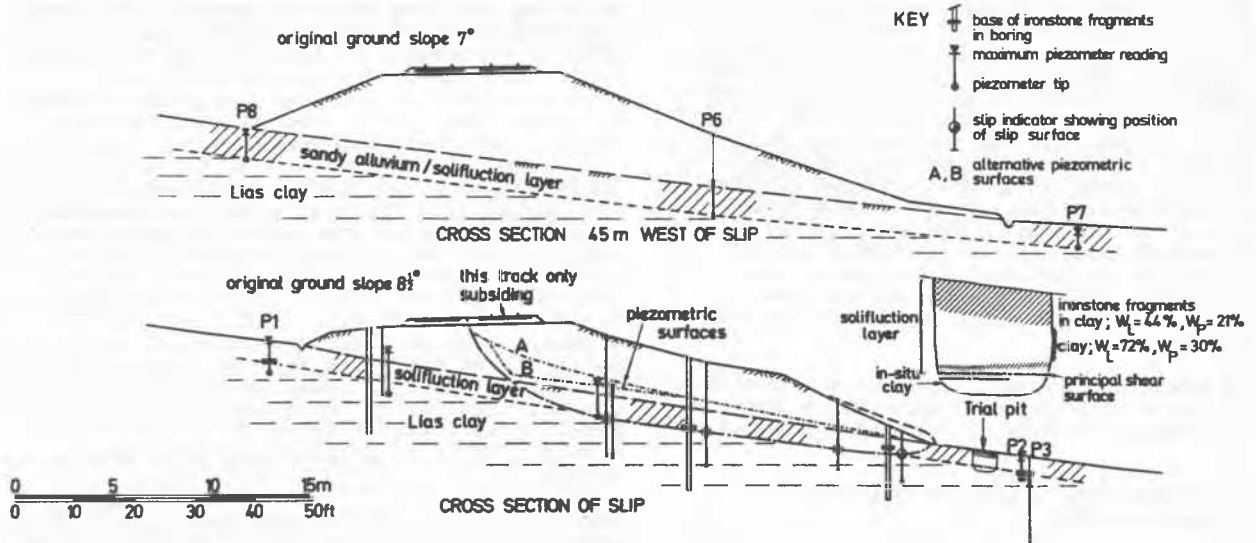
EMBANKMENT FOUNDATION FAILURE, GRETTON, NORTHAMPTONSHIRE
